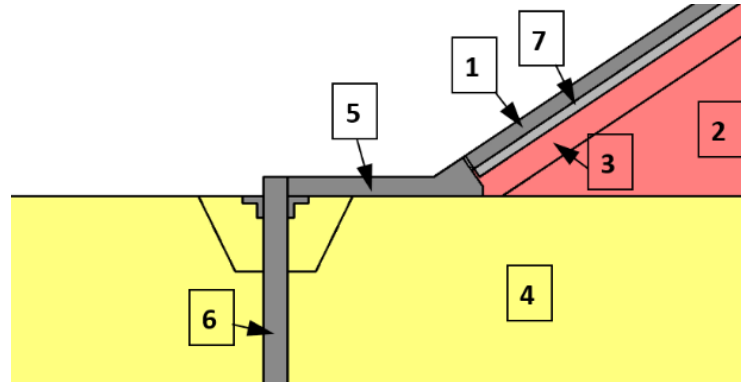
Diagram of the interface of the seepage control facility elements: 1 – reinforced concrete face; 2 – rockfill dam shell; 3 – supporting zone; 4 – foundation layer; 5 – concrete apron; 6 – cutoff wall in the foundation; 7 – lean concrete layer.
